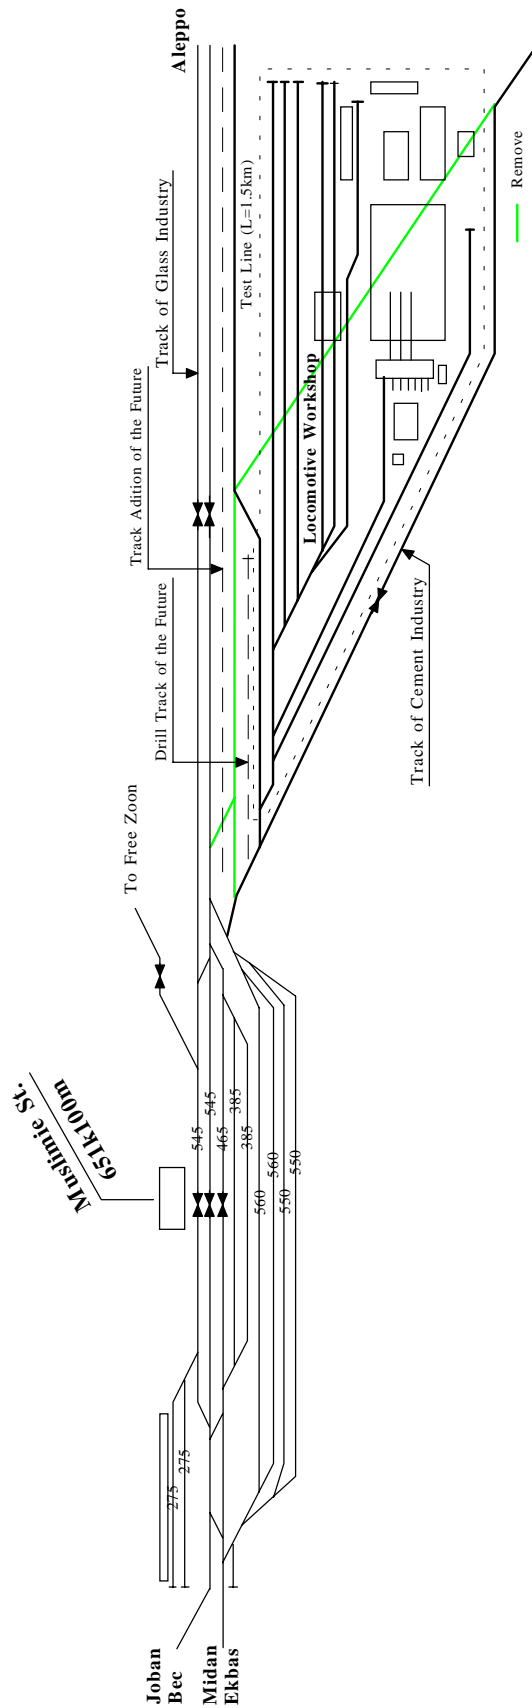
Sketch of Muslimia St. and Loco. Work shop Layout
